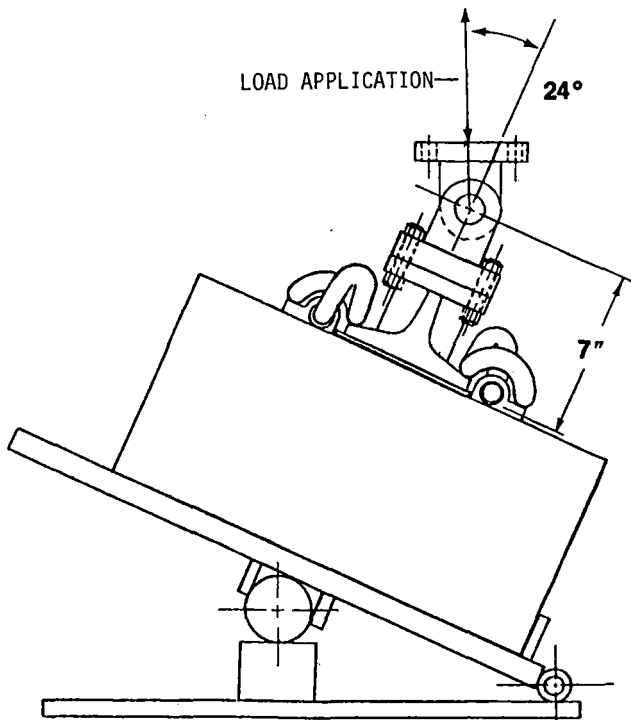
LOADING SCHEMATIC FOR CONCRETE TIE FASTENER FATIGUE TEST.
